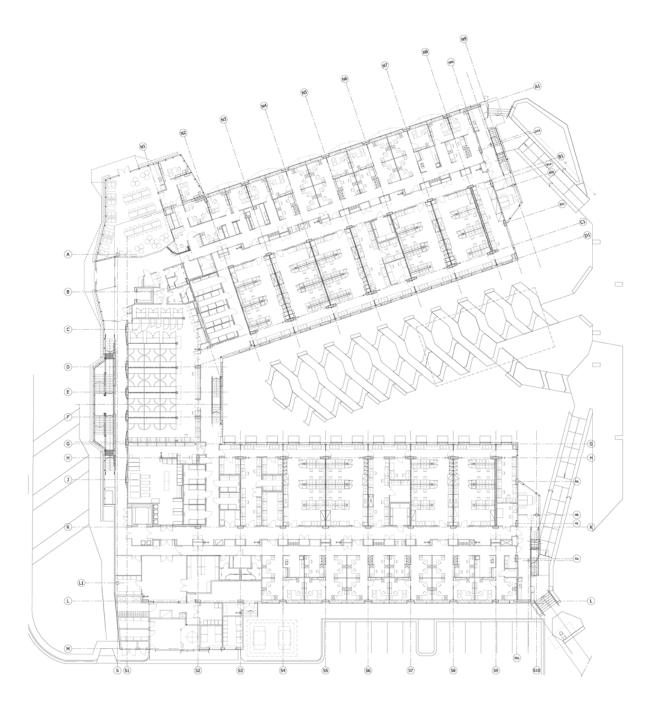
The ground floor plan (ArchDaily 2012)
